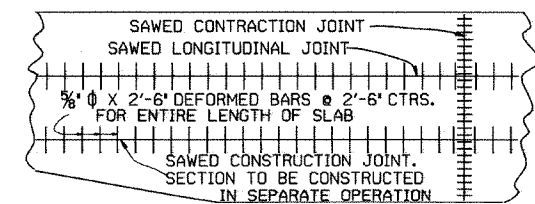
DETAIL OF SAWS LONGITUDINAL JOINT AND LONGITUDINAL CONSTRUCTION JOINT
